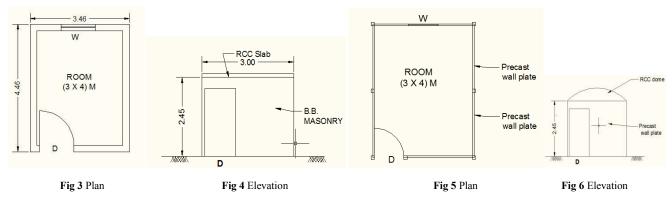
& 6 shows plan and elevation of low cost housing having dimension 3X4M. The foundation of this building is U.C.R. having width 0.45M. and depth 0.6M.
